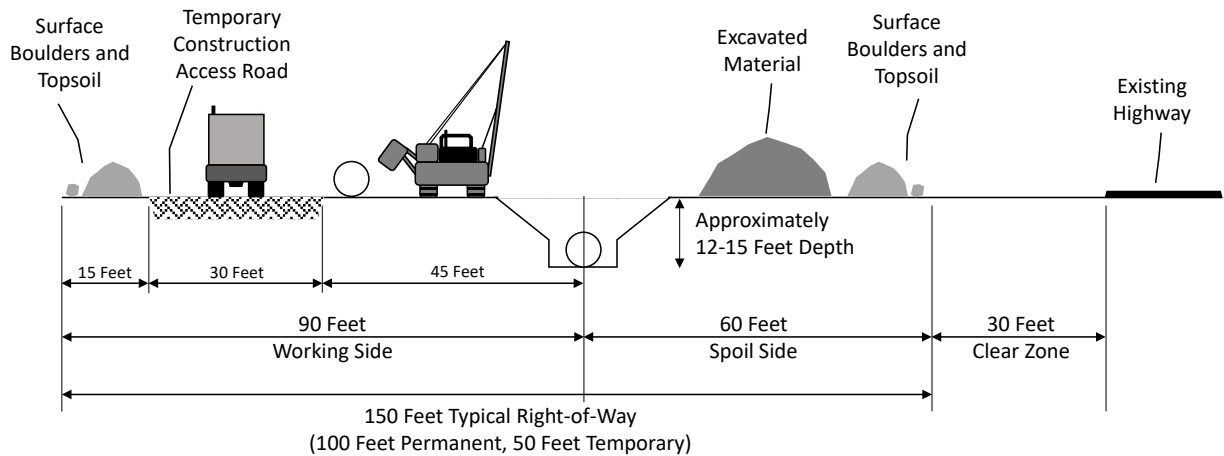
Typical ROW for LPP Pipeline Construction along Highways
